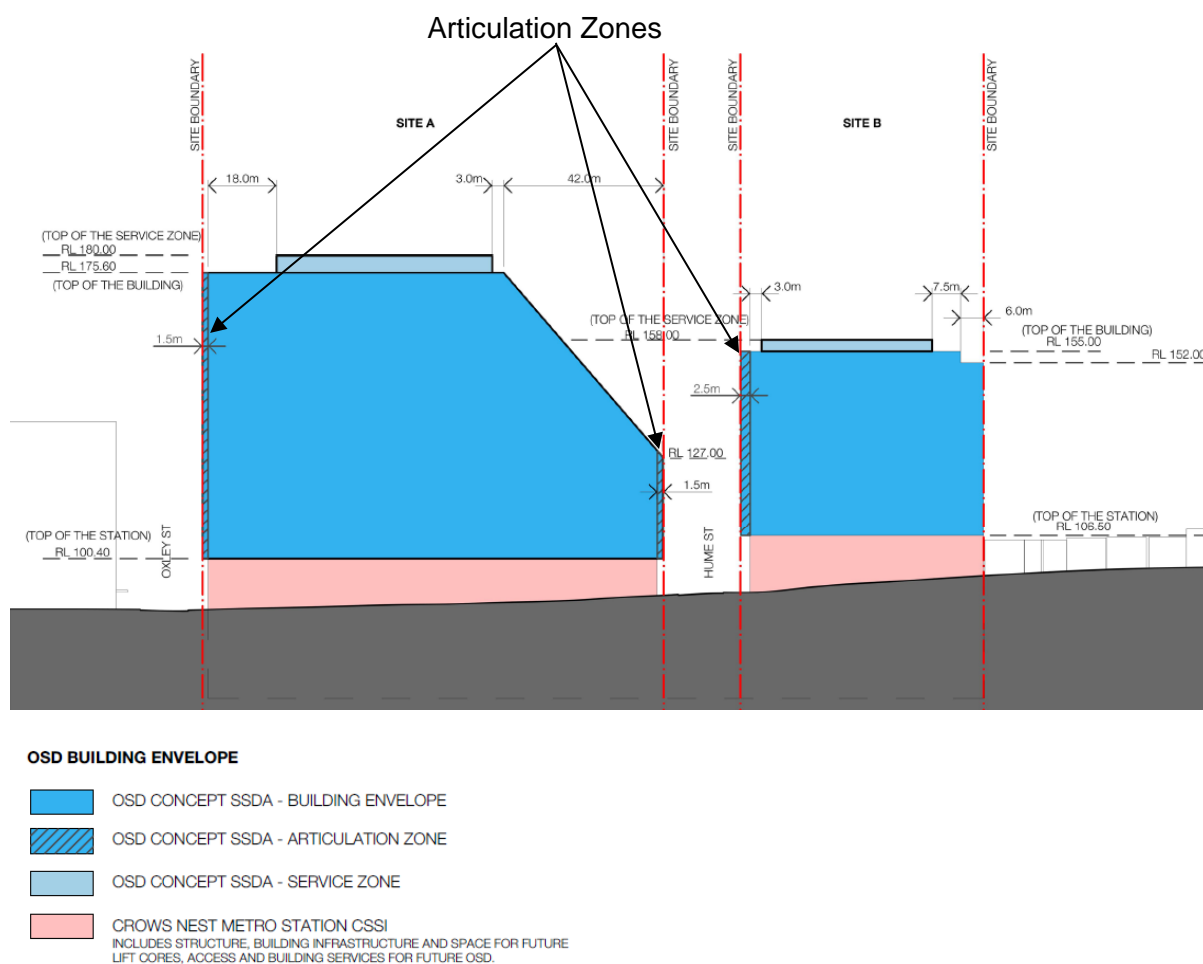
West elevation of Amended Building Envelope showing Articulation Zones
